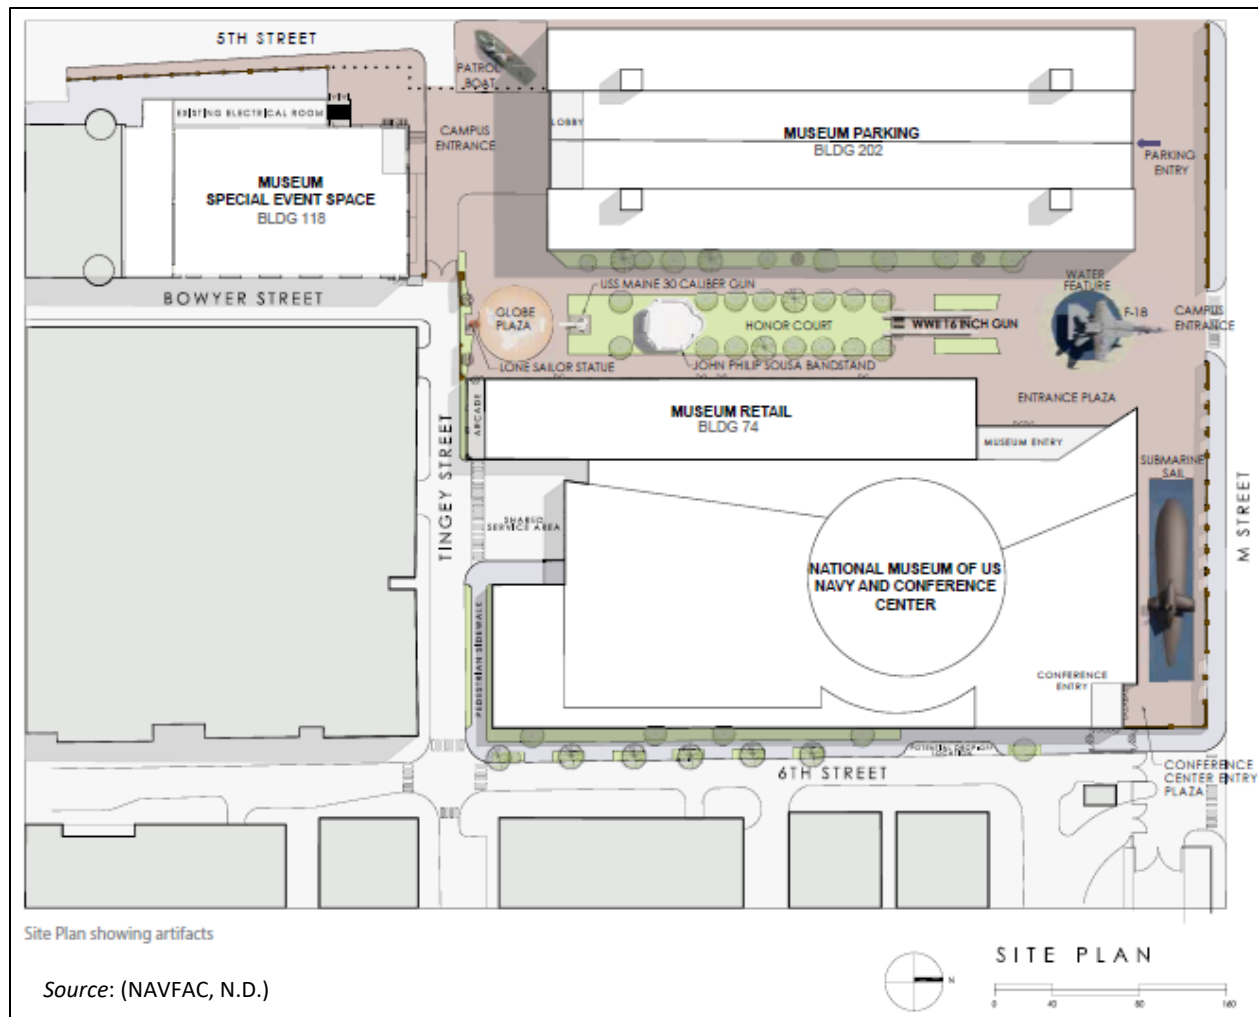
Conceptual Layout of Proposed Buildings for Relocated Navy Museum
